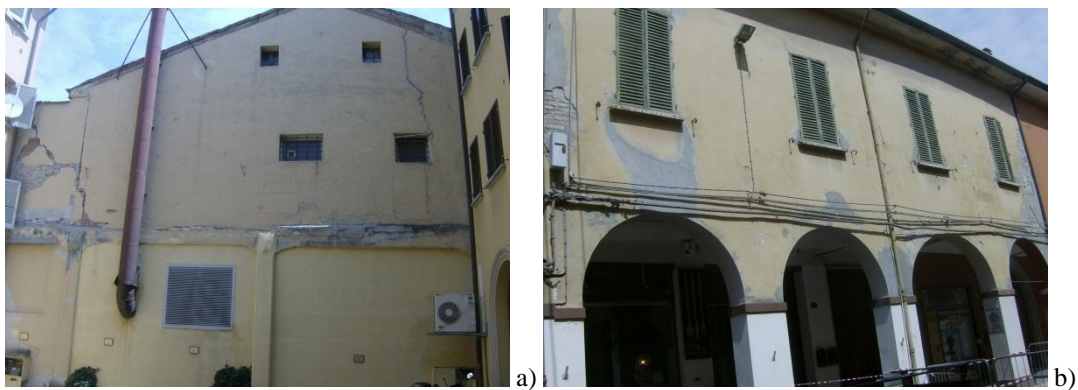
a) South west and b) north west façades of the building in Malagodi street n.8 in the center of Cento.
